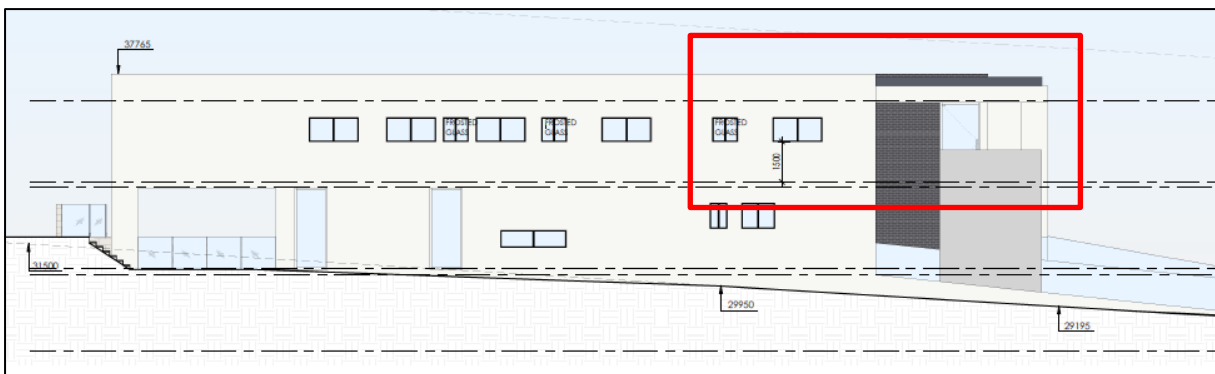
Approved Eastern Elevation (note: Condition 6 imposed to relocate Bedroom 1 to the void area and reduce the void around the stairs, outlined in red)
